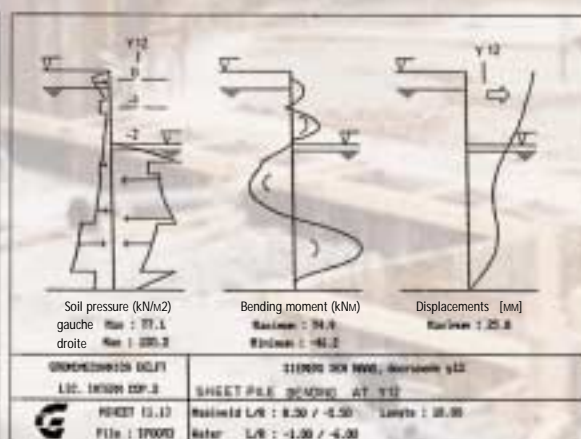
Sheet pile bending at Y12 due to soil and water pressure
